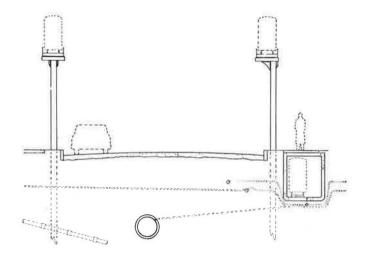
Street cross section with elevated tramways and subsurface tramway under sidewalk.
